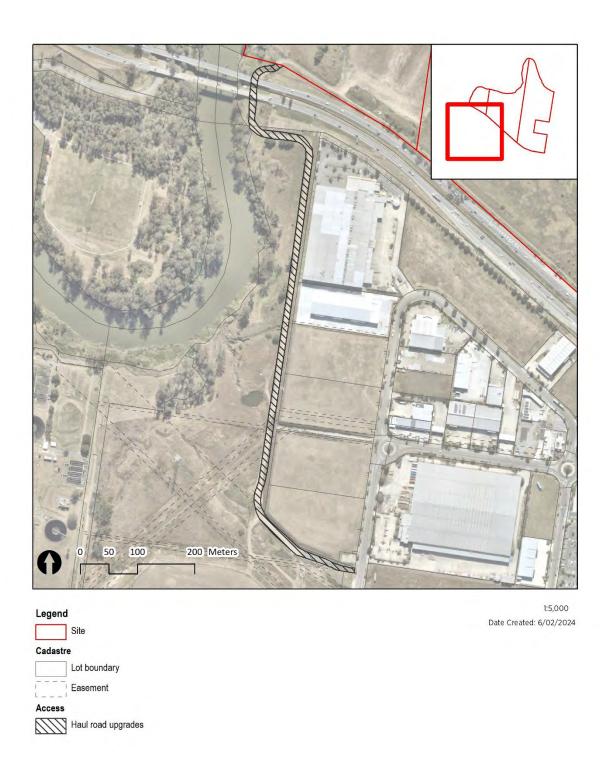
SITE ACCESS AND HAUL ROADS TO THE DEVELOPMENT FOOTPRINT (HAUL ROAD DRAWING).
